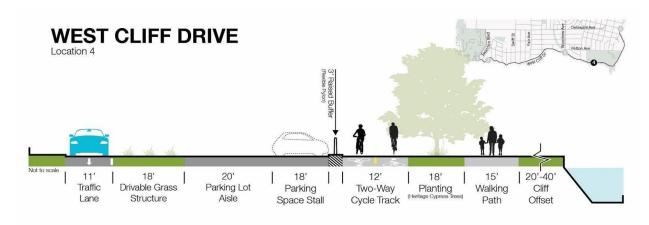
Alternative 2 Concept- Cross Section of State Parks Parking Lot A
